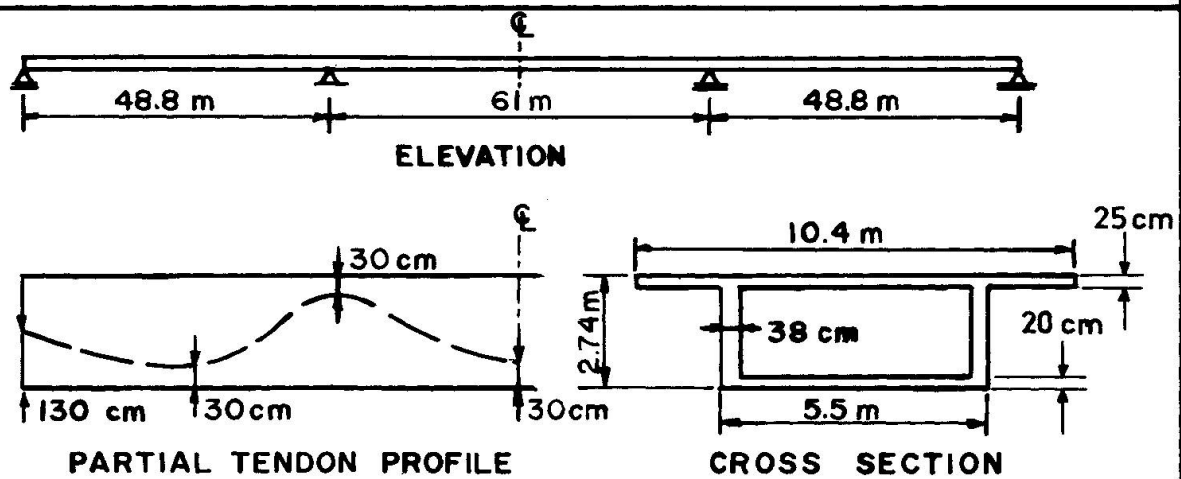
CONTINUOUS POST TENSIONED CONCRETE SINGLE CELL BOX GIRDER BRIDGE
